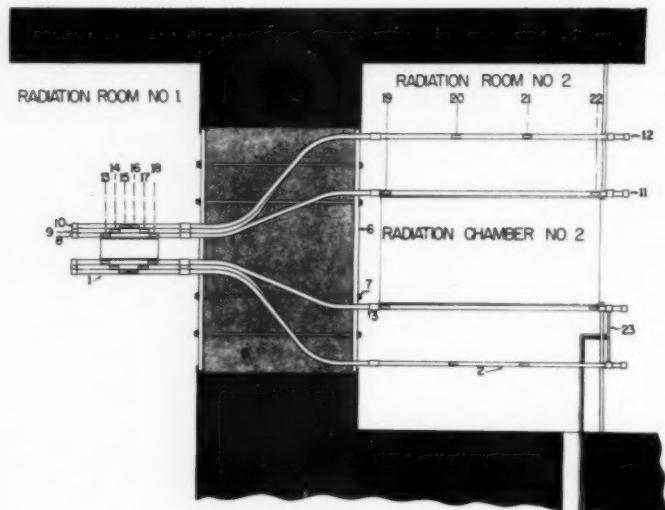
Sectional view of pneumatic tube transfer system; cobalt irradiator.
